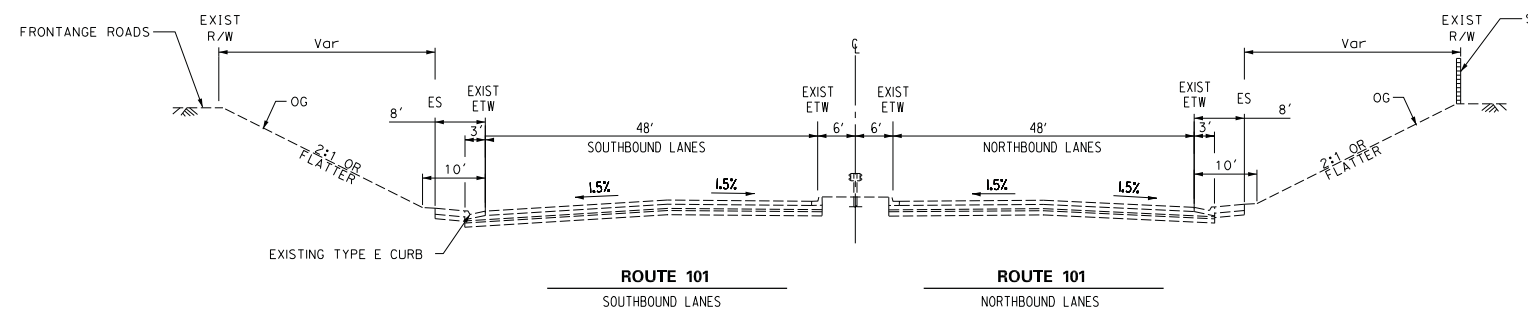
Existing Freeway Typical Section without On or Off-ramps
